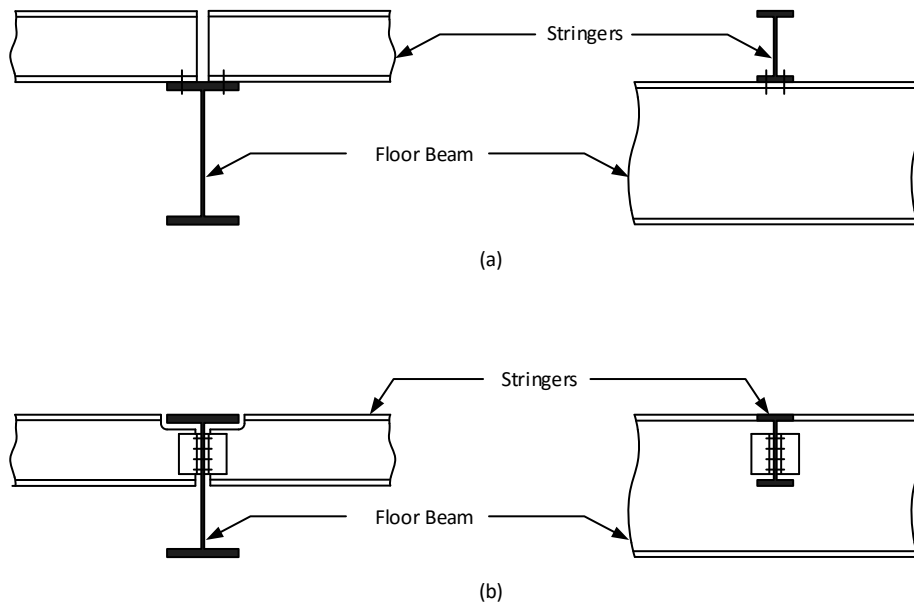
(a) Underslung and (b) Framed Floor System Configurations
